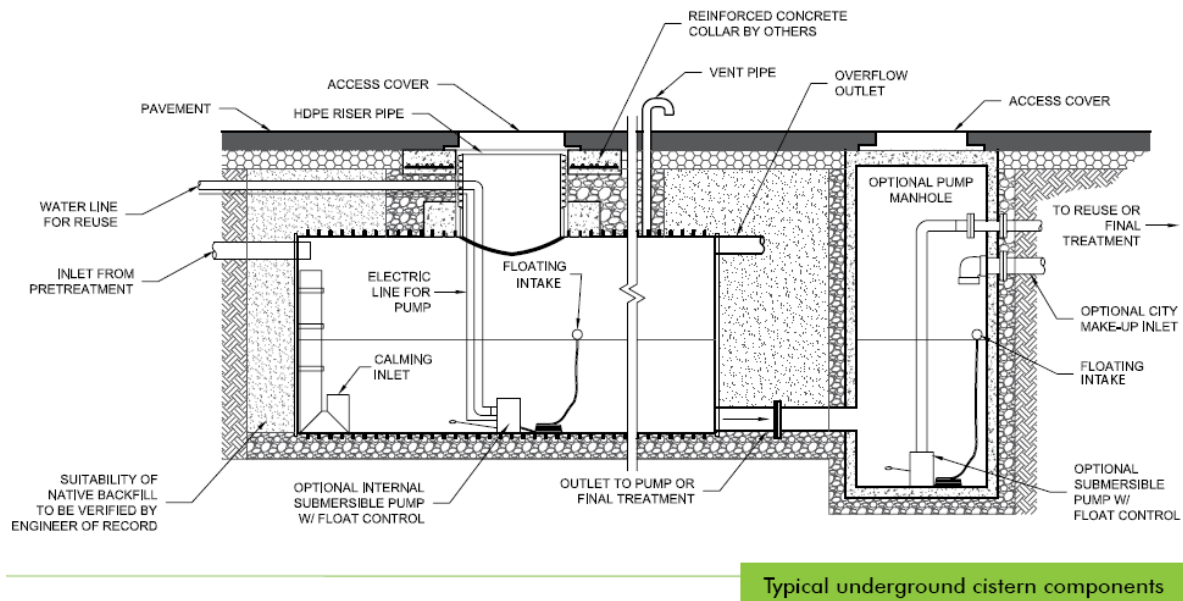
Schematic Design of an Underground Stormwater Harvesting System (image provided by Contech Engineered Solutions)
